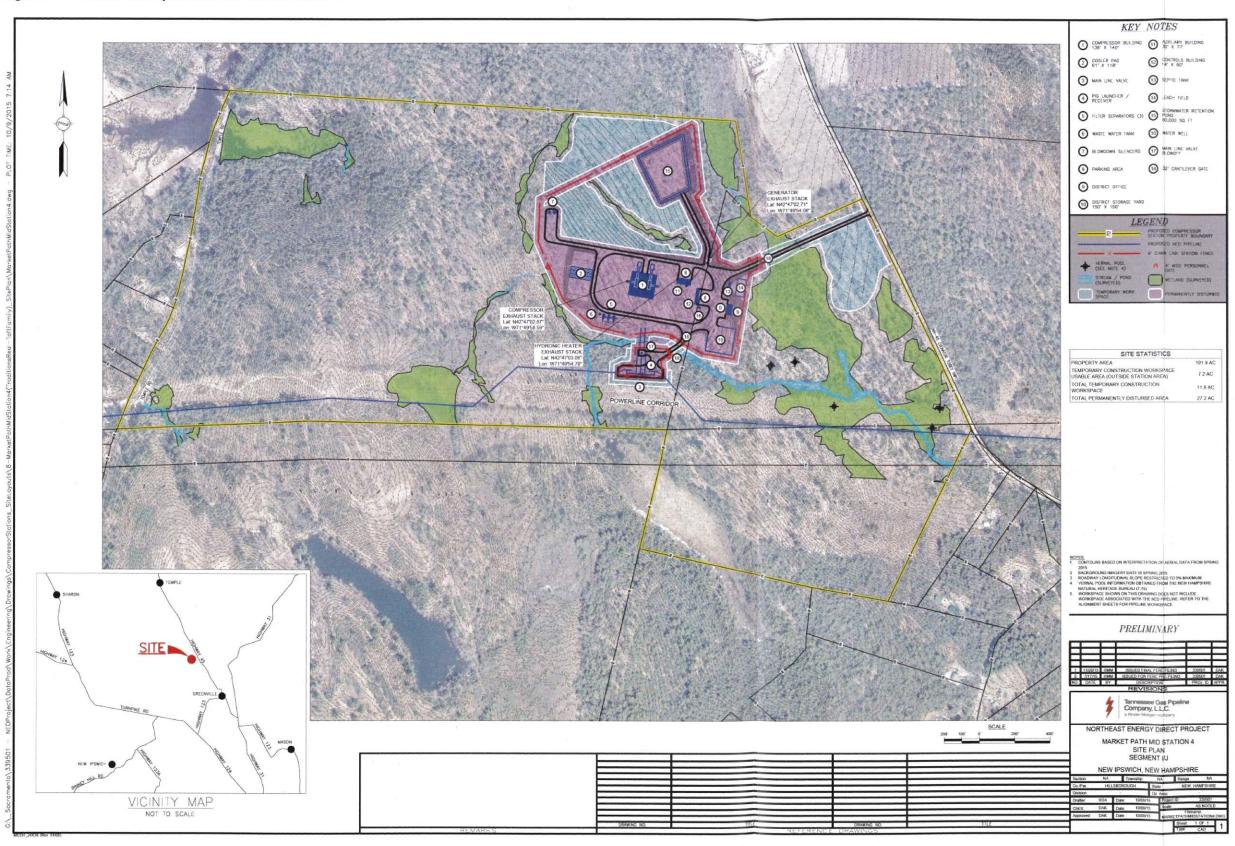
Site Plan of Proposed Market Path Mid Station 4
